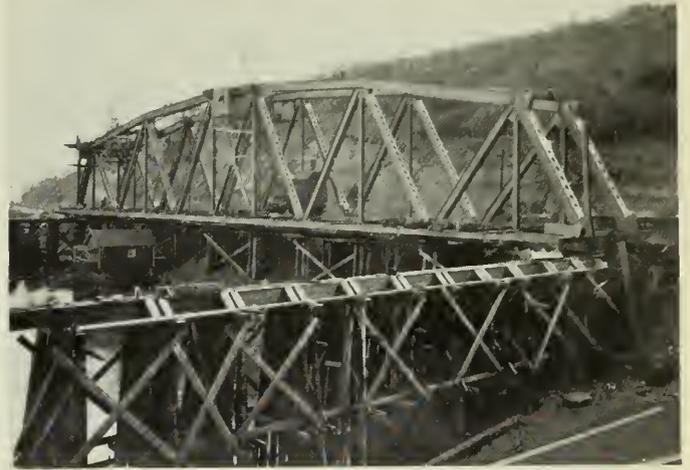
Runways and Falsework for Erection of Lifting Span.
